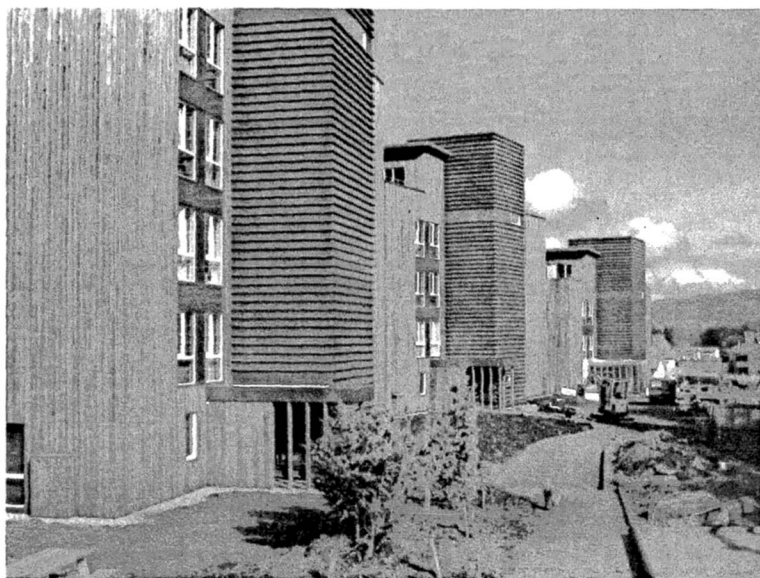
Apartment buildings in Bergen, Norway, with furfurylated wood siding. Photo: WPT, Norway
